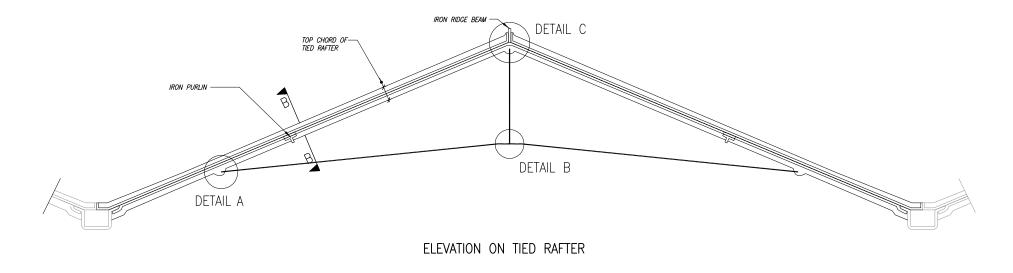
Sketch drawing from observation of existing 1879 canopies on platforms 2–4 showing roof details
